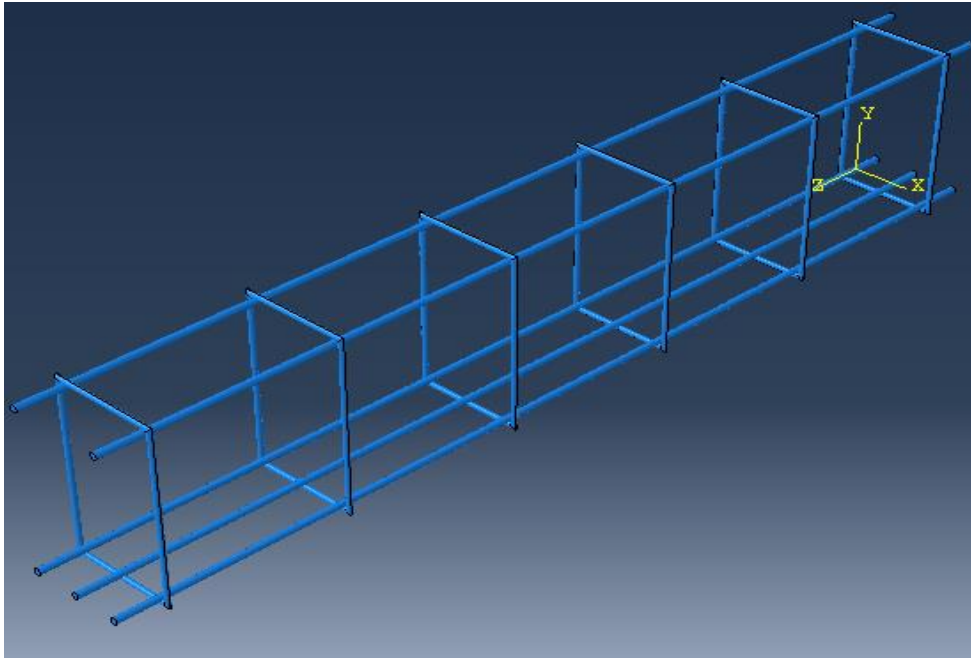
4 Longitudinal Reinforcement bars and stirrups layer FEM model.
